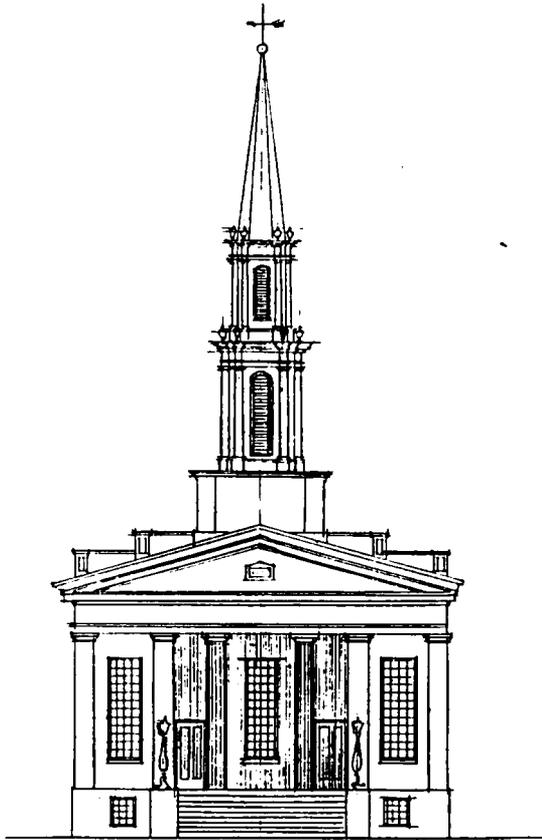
Wilson's drawing of the second building for the First Presbyterian Church, built facing Lafayette Square in 1834 (Wilson 1988:back cover).
